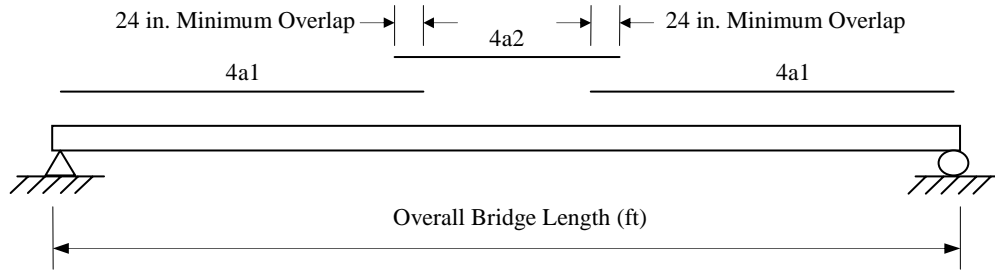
Typical longitudinal layout of the T & S reinforcement.
